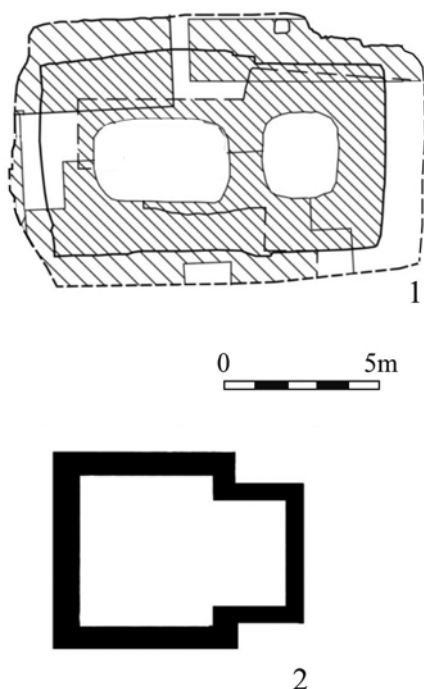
Plans of building A on Wysoka Górka (1) and the church in Podgórze (formerly Spas) (2).
